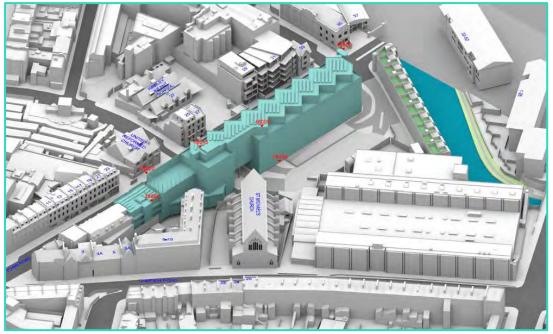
Drawing Number: P1555/89 – 3D View – Existing buildings within the cumulative surrounding context
